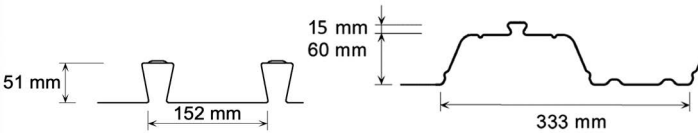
Cross-sections of a nominal 50 mm re-entrant deck and a nominal 60 mm trapezoidal deck
